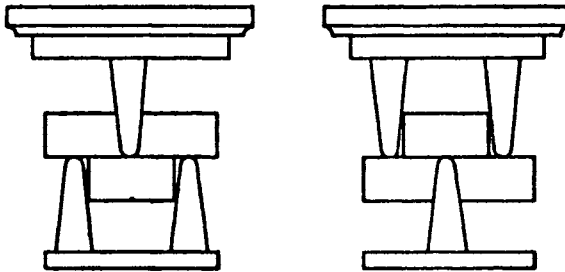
CROSSED — TILE SPECIMEN MOUNTED ON SPECIAL HEAD
